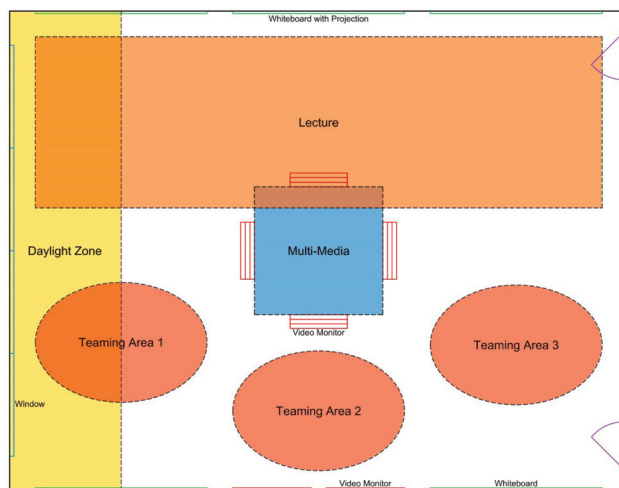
Floor plan of classroom application used for the DOE funding opportunity.
